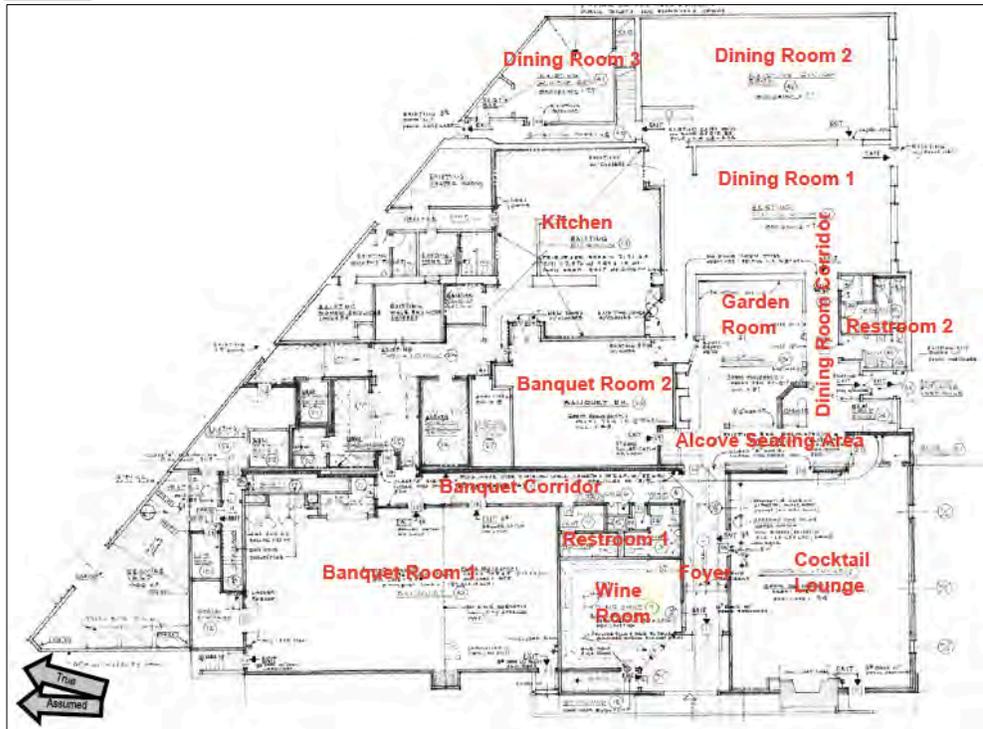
Ground floor plan with overlay identifying current nomenclature (base plan by Nielsen, Moffatt & Wolverton)
